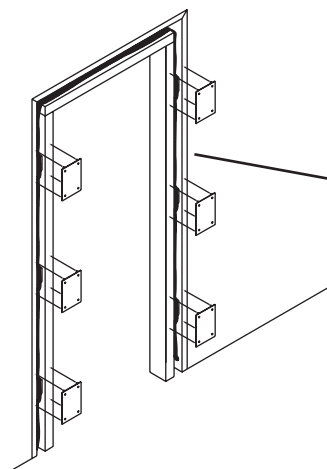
Running speaker wire between a wall and a removed doorjamb. Nail plates are also installed to protect the wire when the doorjamb is replaced.
